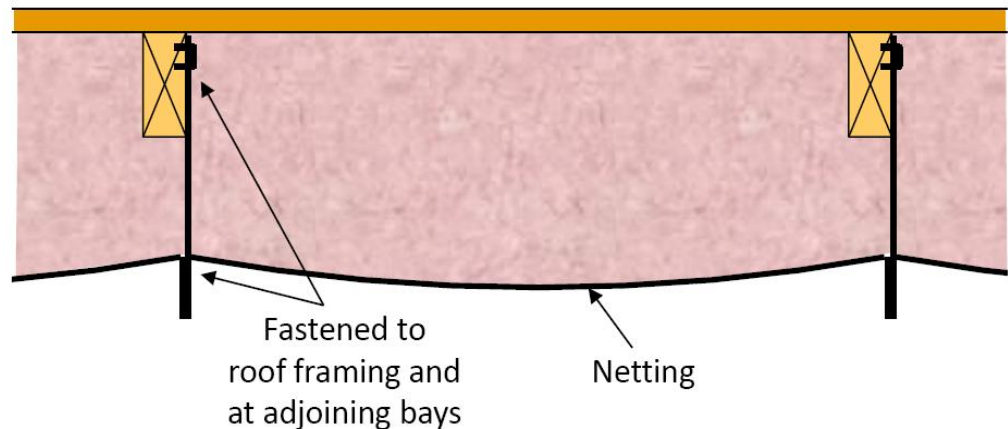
Netting insulation installed below the roof deck. Image courtesy of Owens Corning².
